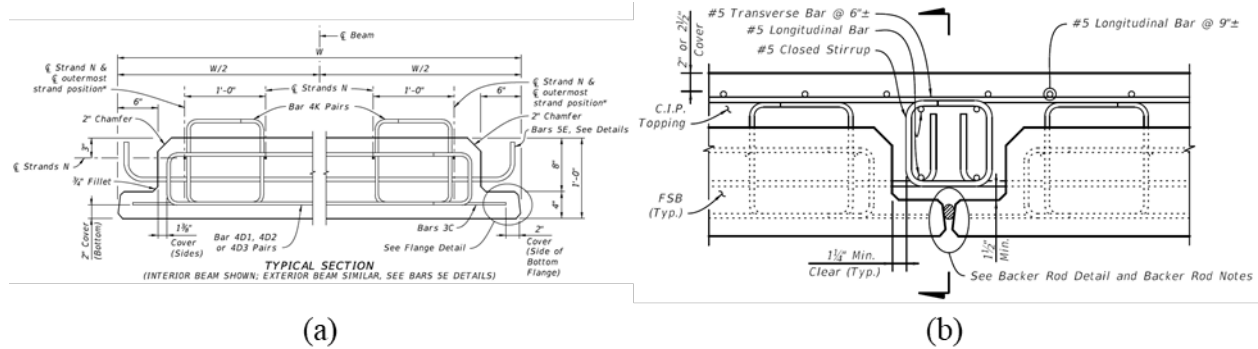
Typical section details for 12-inch deep standard FSB section used for Case 1 modeling: (a) cross-section details [19] and (b) joint details [19]
